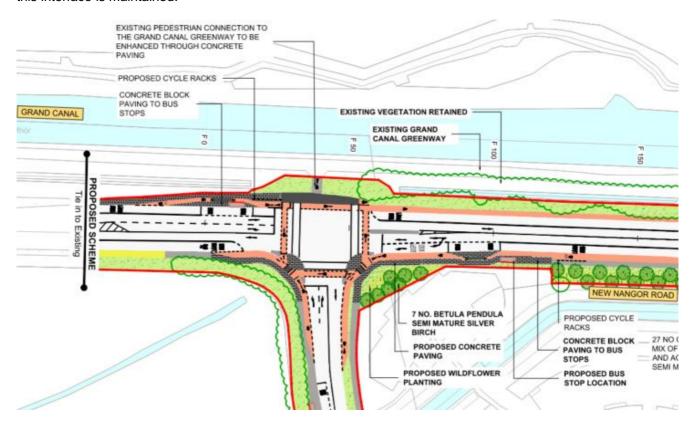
Junction of Woodland Walk and New Nangor Road connecting with Grand Canal Greenway
